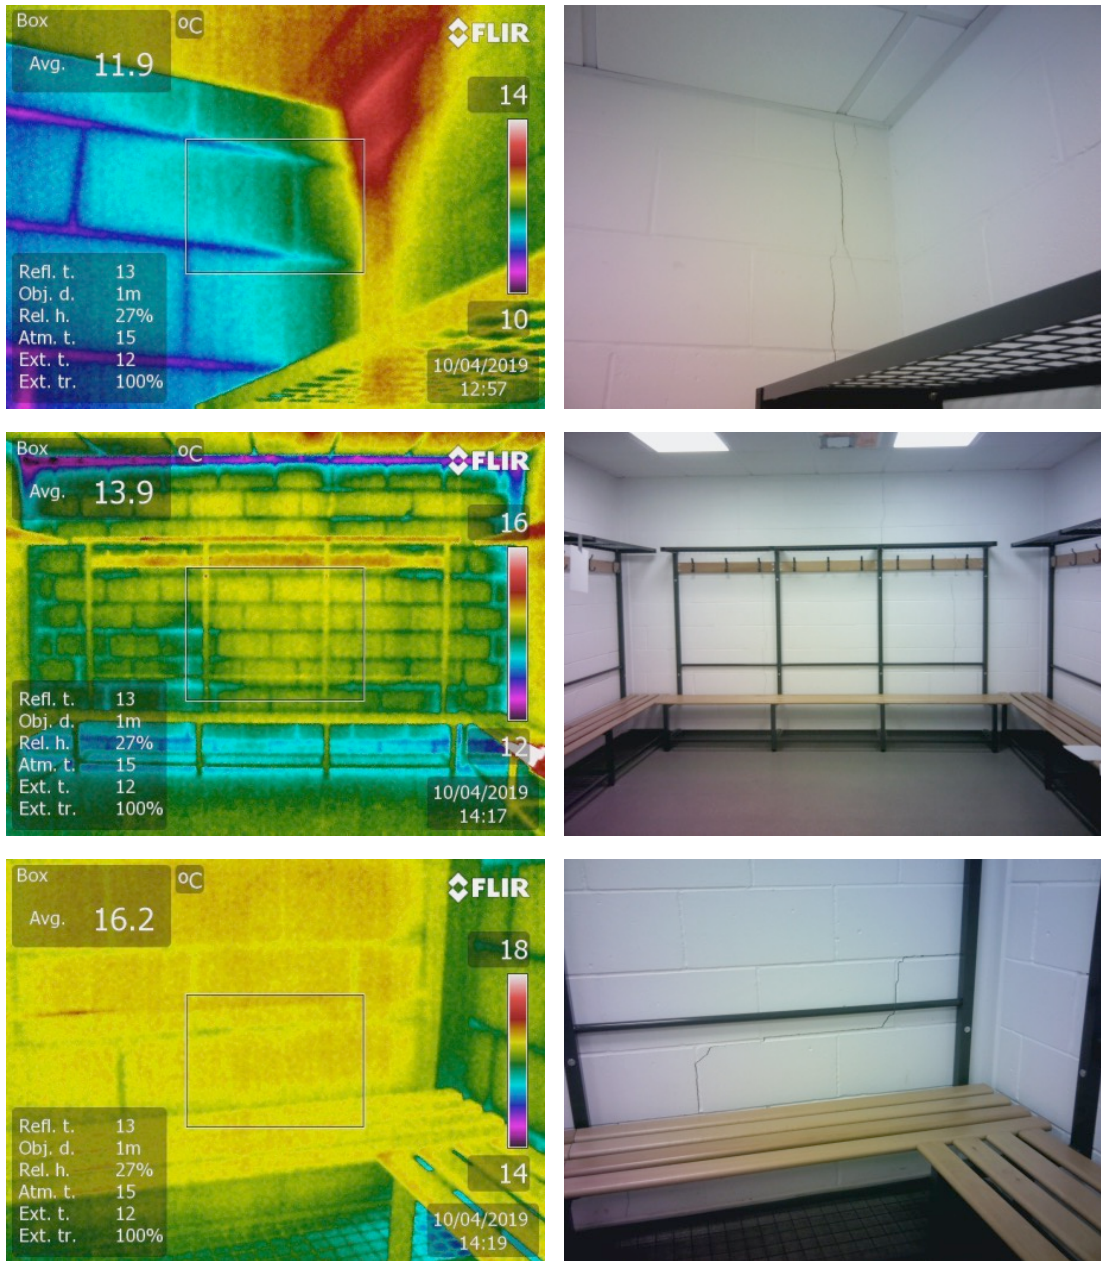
Thermal images and digital images of cracks in the internal wall (changing room 6)
